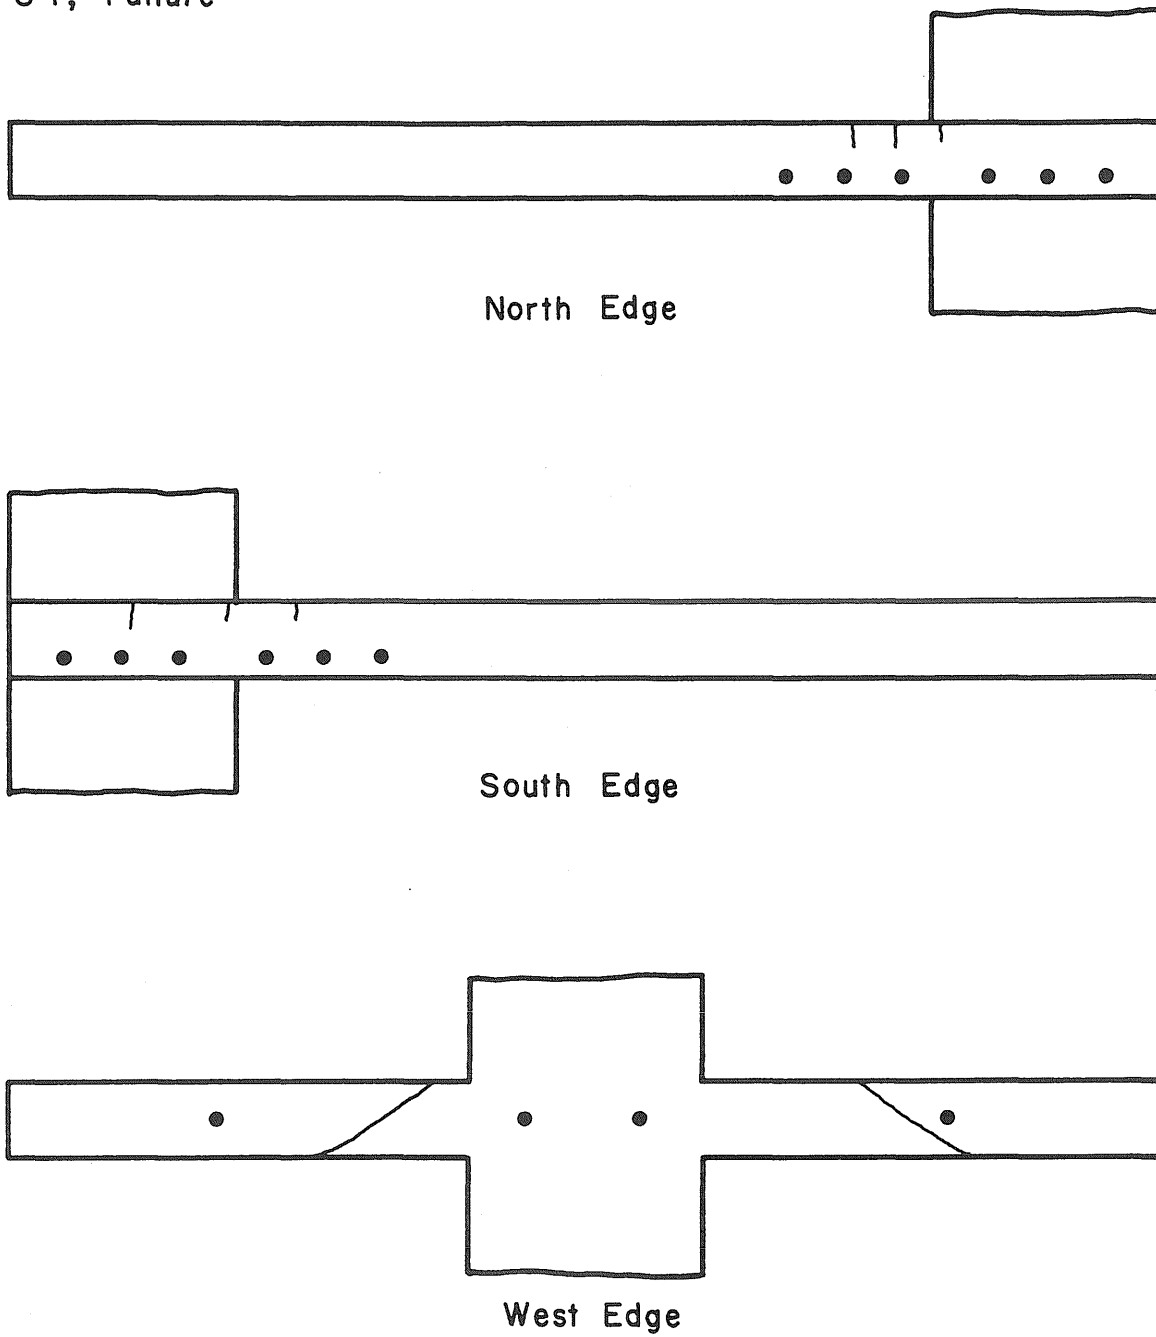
Crack Pattern at Failure on the North, South and West Edges of Specimen S4
